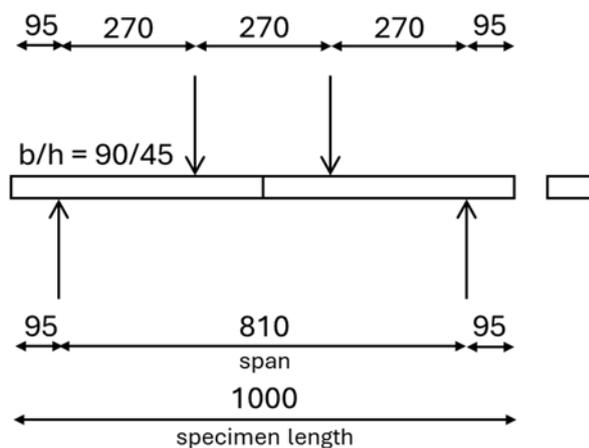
Test setup and dimensions of the bending test specimens with finger joints in [mm]
